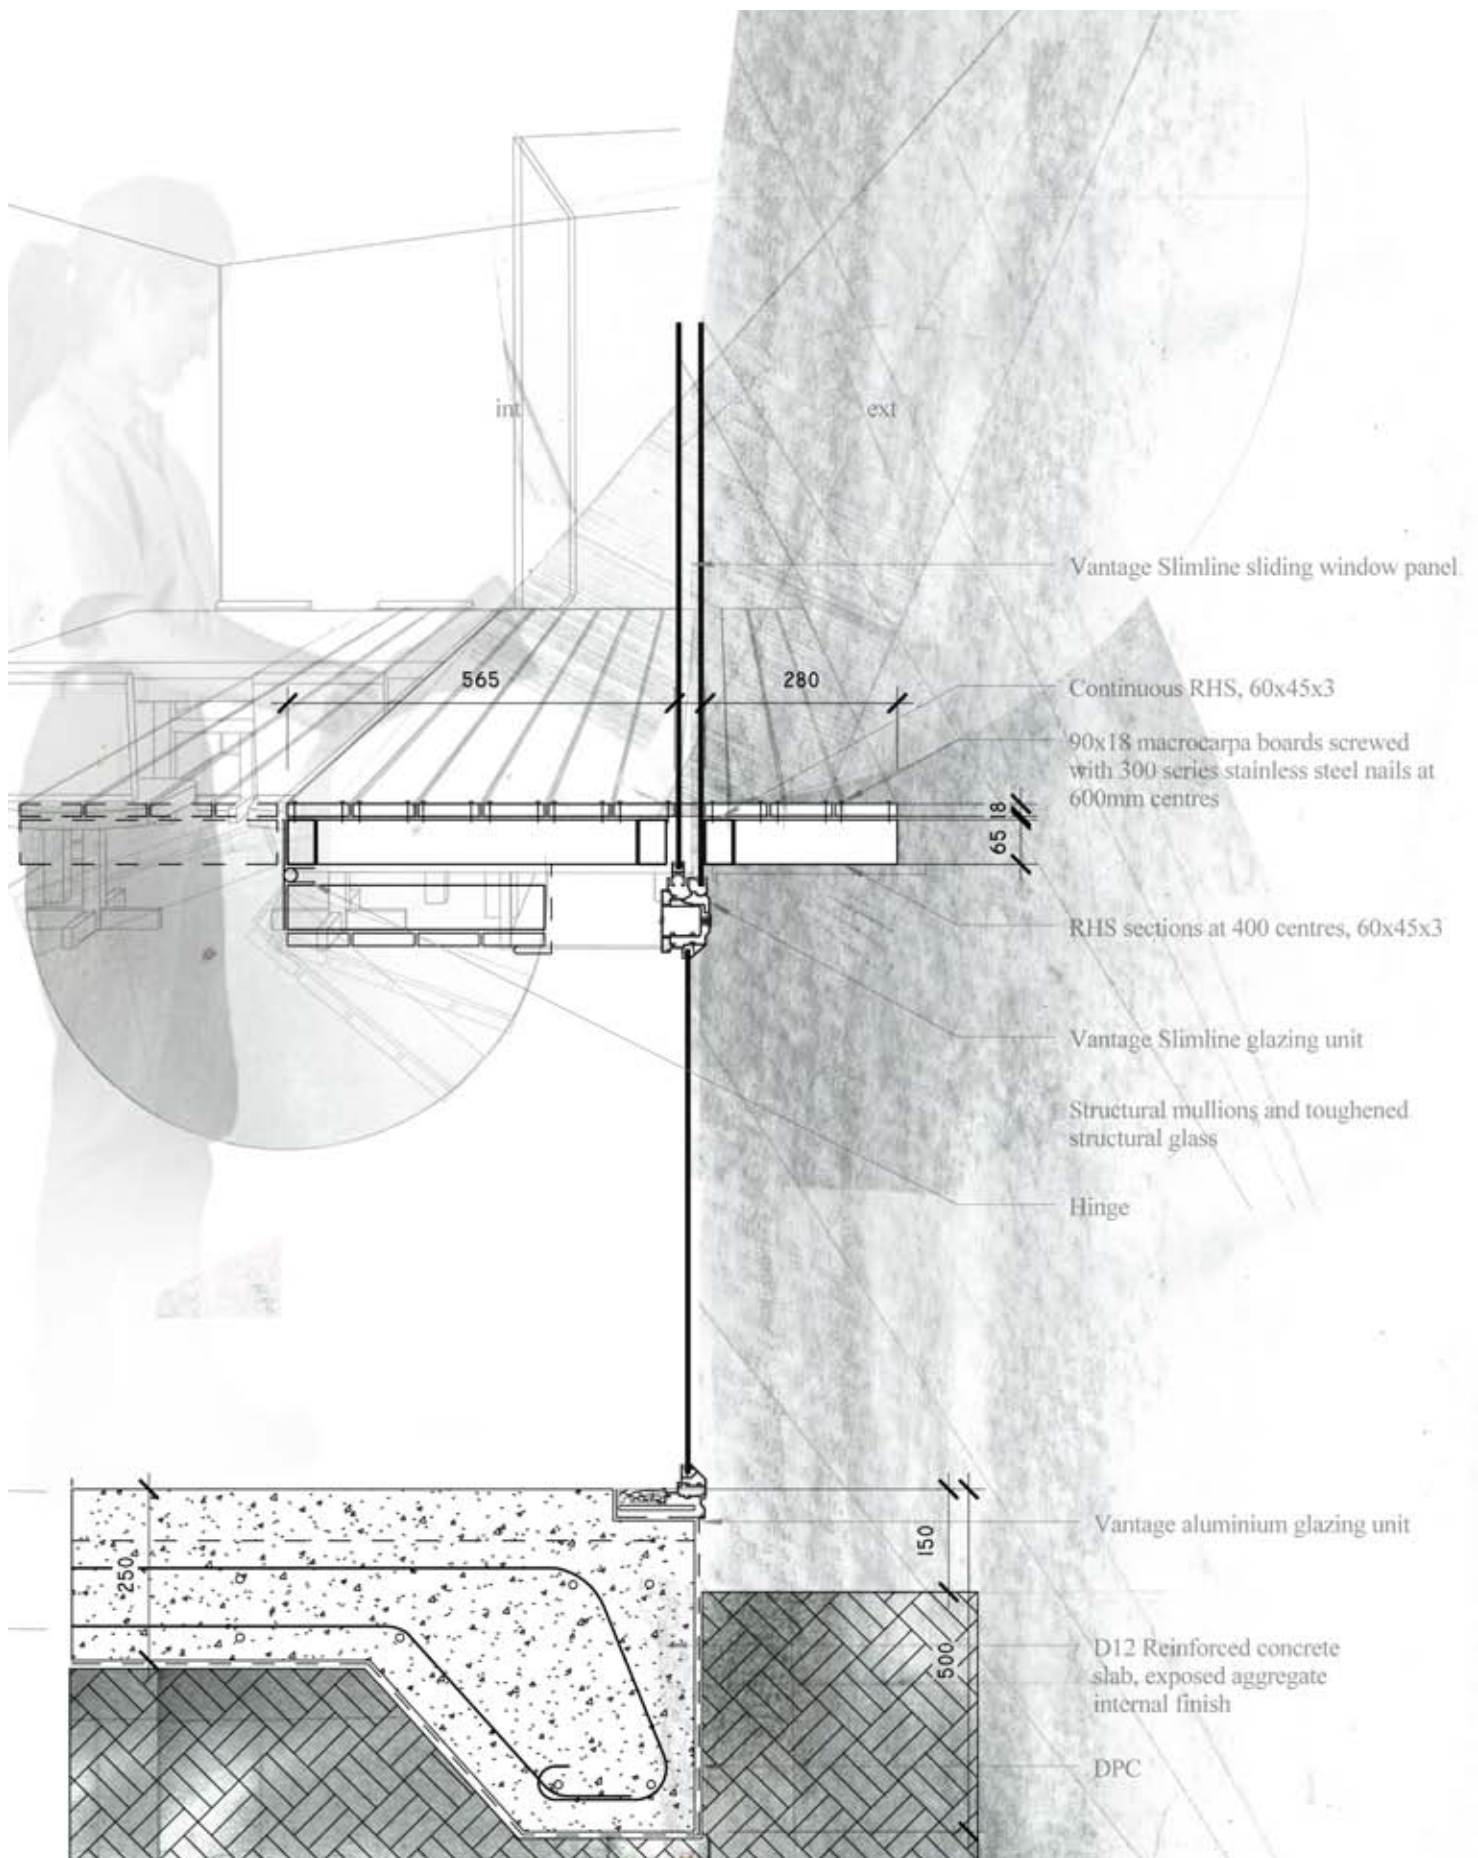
Detail IV (1:10). Work bench and glazing unit within lower floor meeting and kitchenette area enabling blurring between exterior/interior and interior public spaces. Created by Author. Hand and digitally composed.
